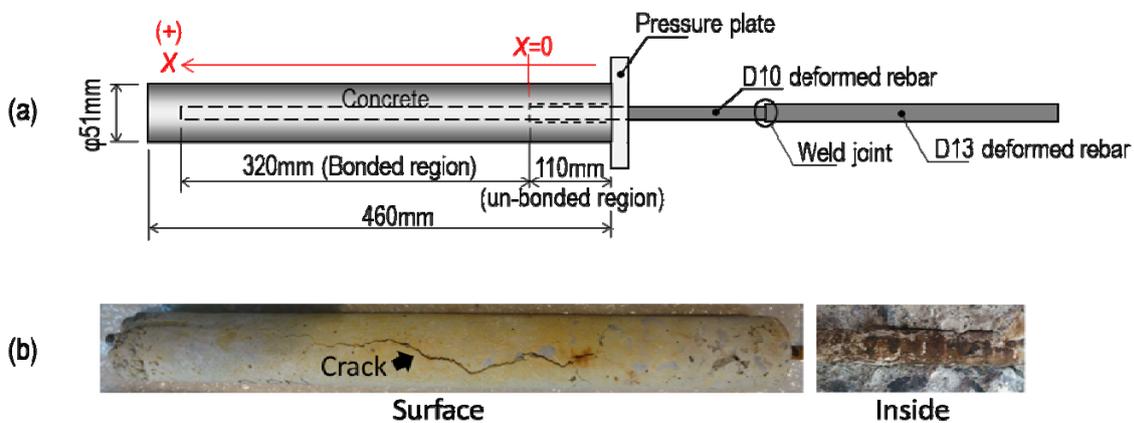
(a) A schematic illustration of the RC specimen used in this study and (b) the surface view of the specimen and inside view of the another specimen with the same treatment.
